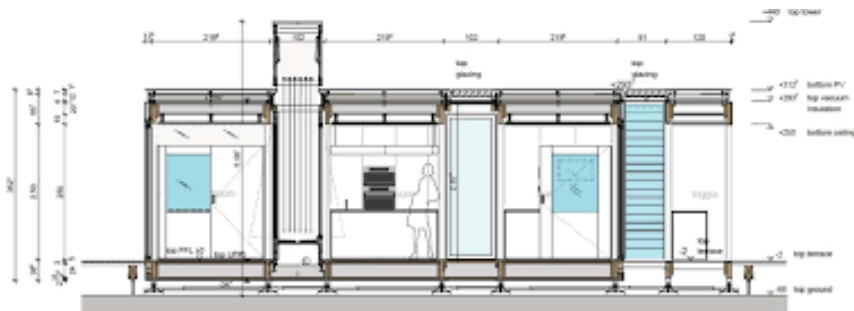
'Home +' section (Team HFT Stuttgart, 2010)
